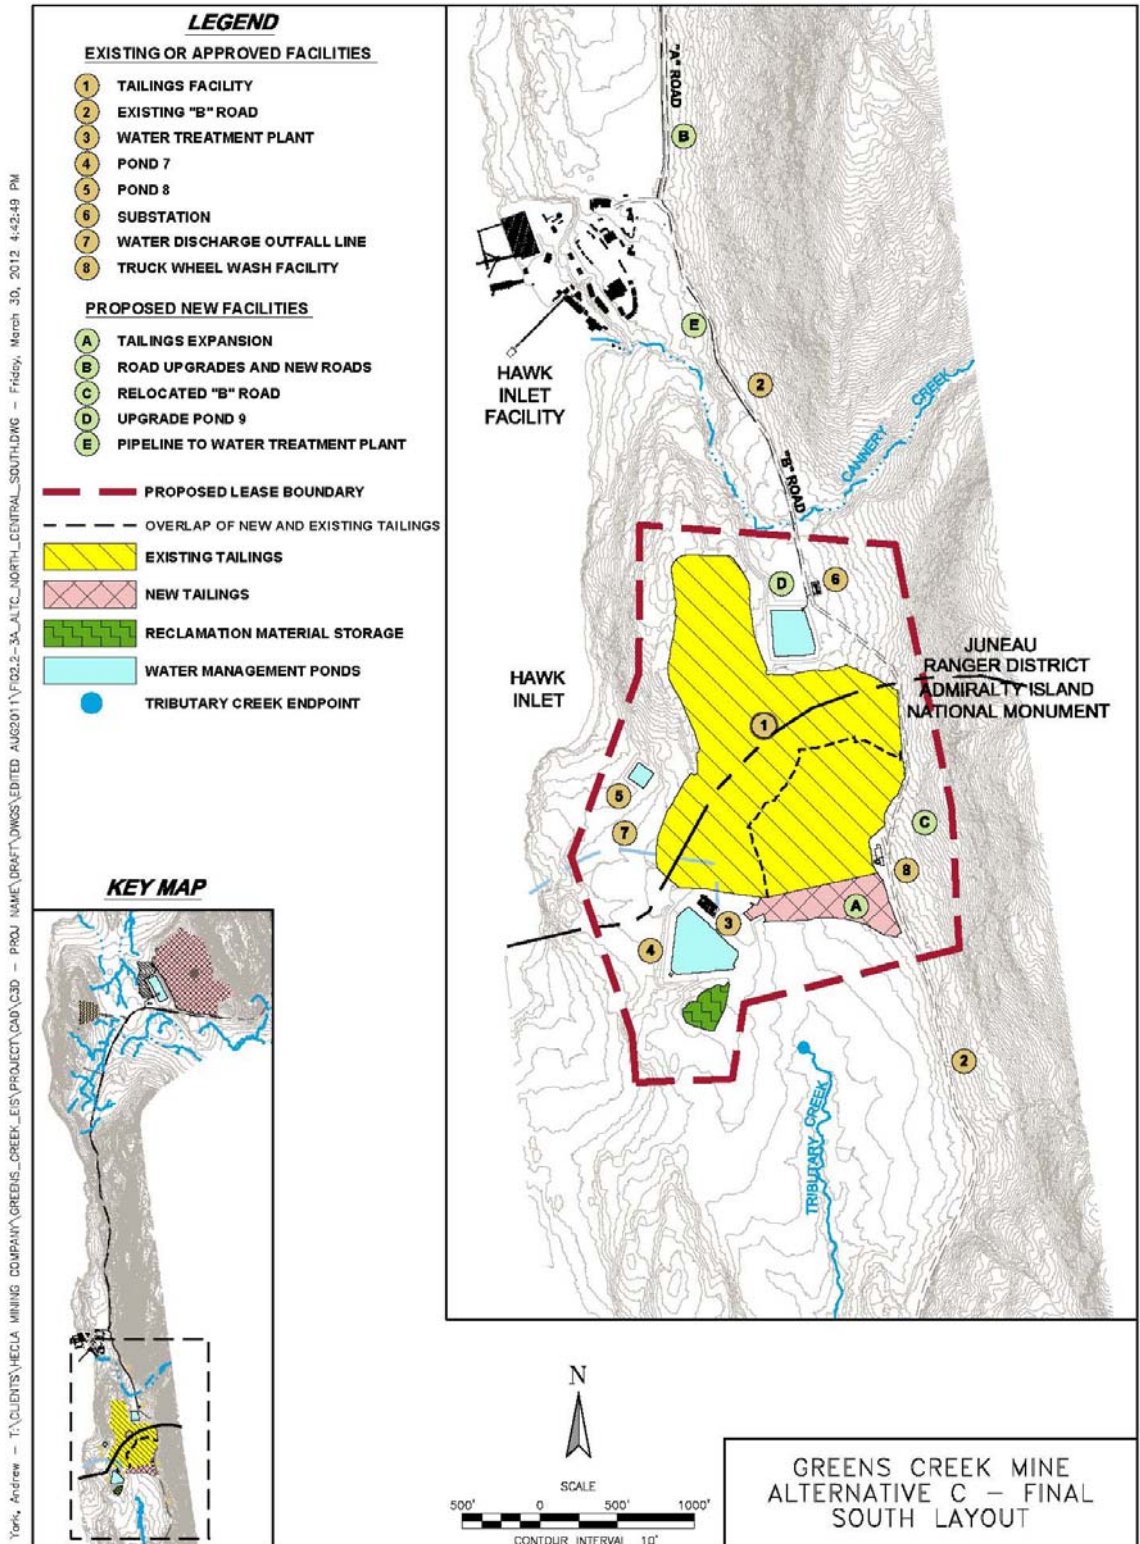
Greens Creek Mine Alternative C – Final South Layout.
